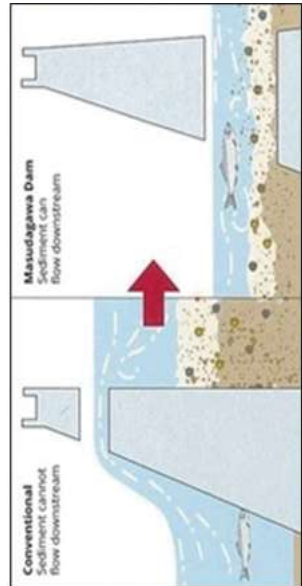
Sketch of Masudagawa Concrete Dry Dam (KNI-BB, 16-18 May 2017 Padang, YZ&AM)
